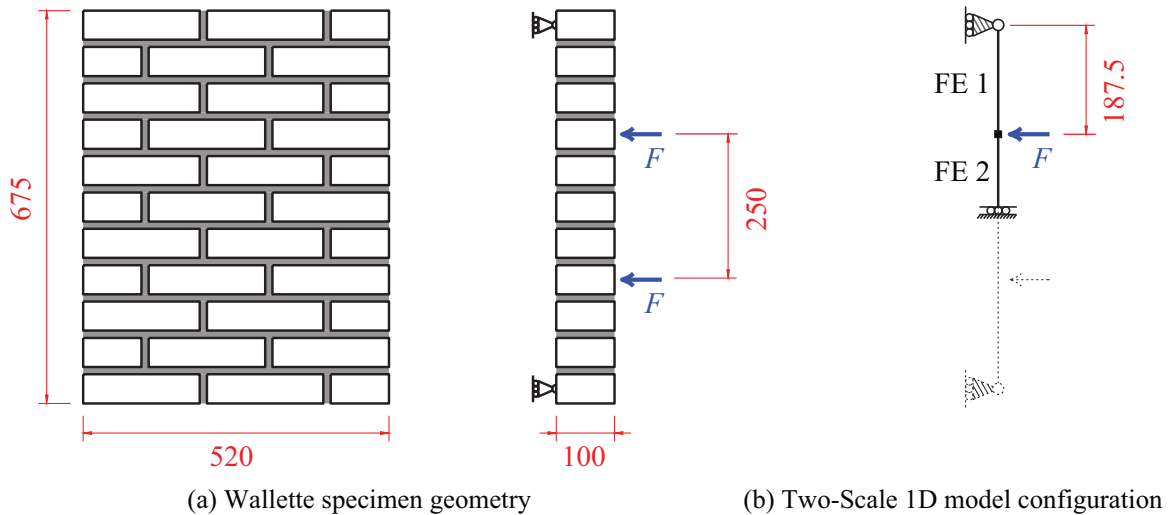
Four-point out-of-plane bending test of the masonry wallette: (a) specimen geometry and (b) macromechanical beam model (dimensions in mm).
